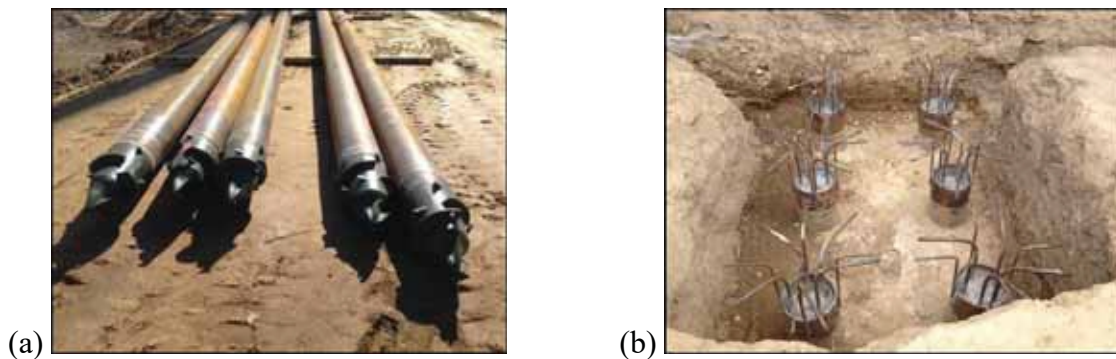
Photographs of (a) sacrificial drill bits welded to steel pipes and (b) internal reinforcement and concrete placed in open inner annulus of the steel pipe (Marinucci and Wilson, 2018)
